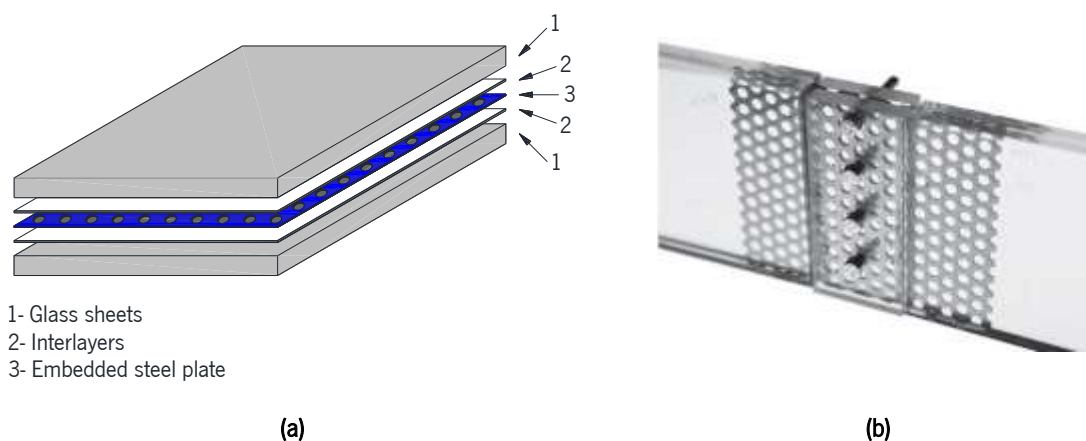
Embedded reinforcement system: (a) assemblage of the laminated glass panel; and (b) embedded reinforcement acting as a connecting element.
